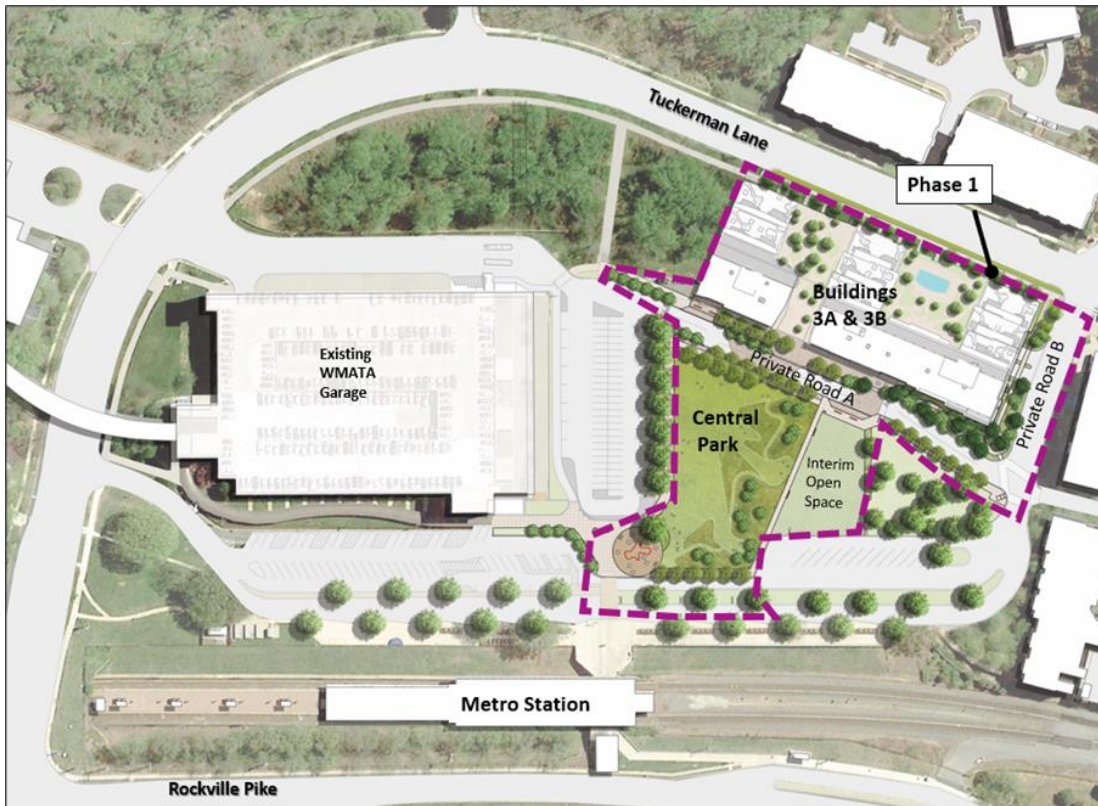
Illustrative Site Plan No. 820220070 (limits of site plan outlined in magenta)
